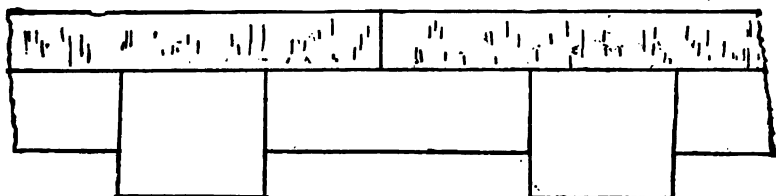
PLAN SHOWING MANNER OF LAYING GUTTER-STONES.
